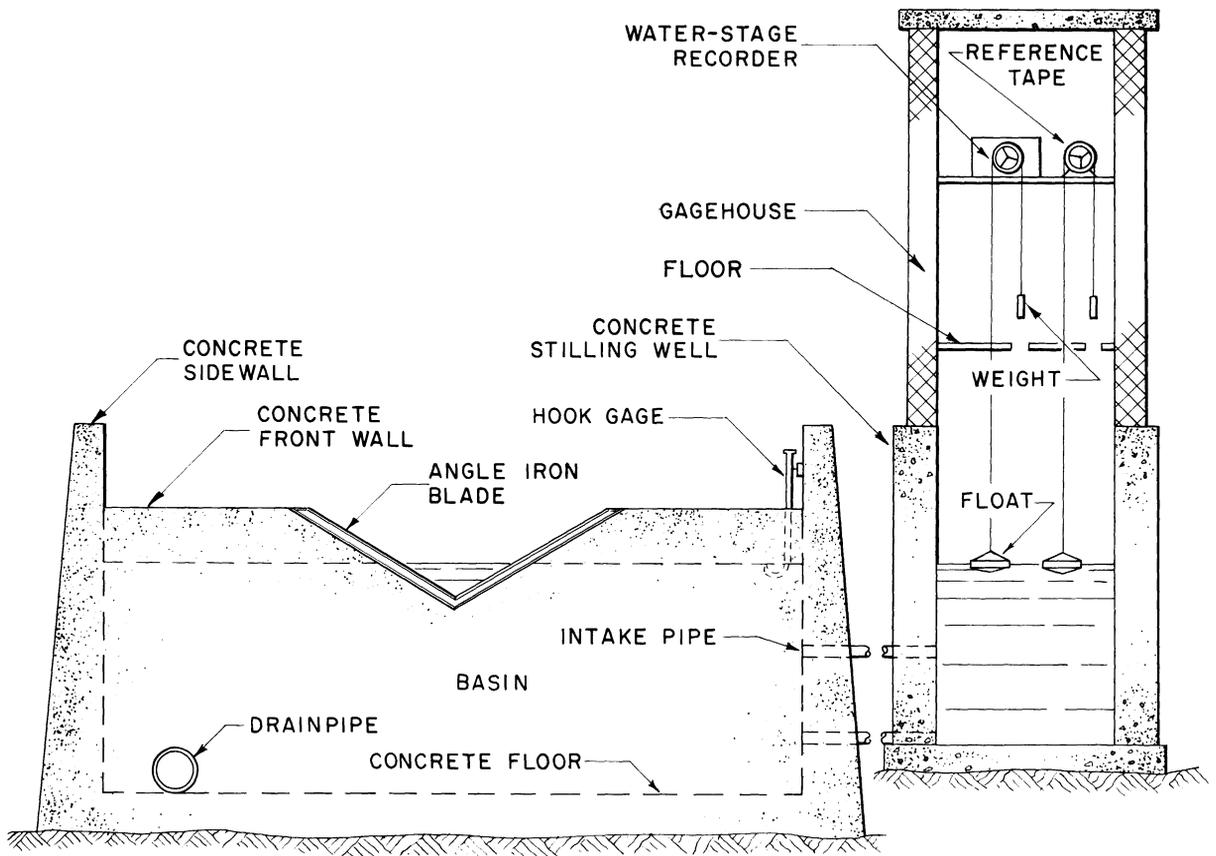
Schematic diagram of 120° V-notch weir, watertight-box design.
